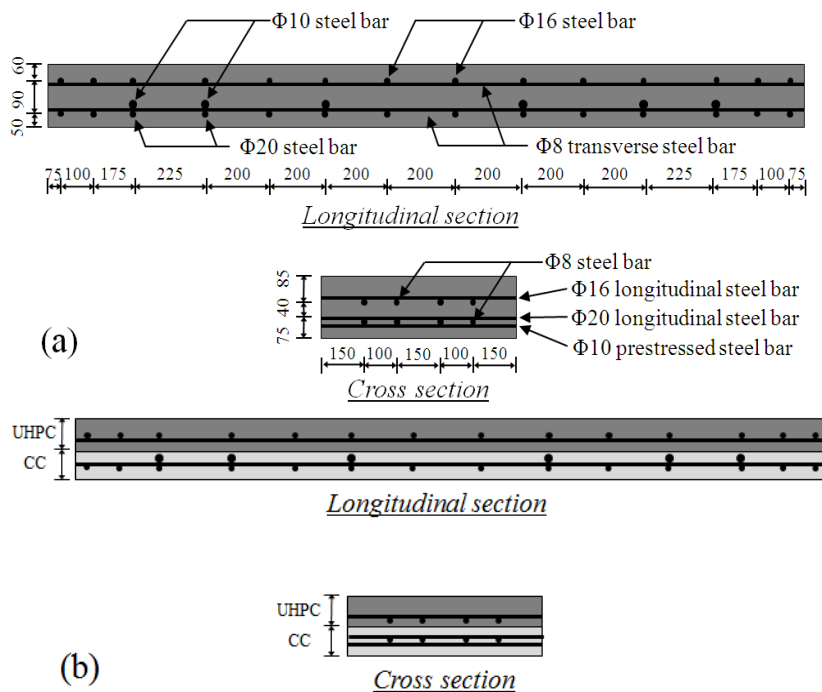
Design of specimens (unit: mm): (a) CC and UHPC slabs, and (b) FGC slab.
